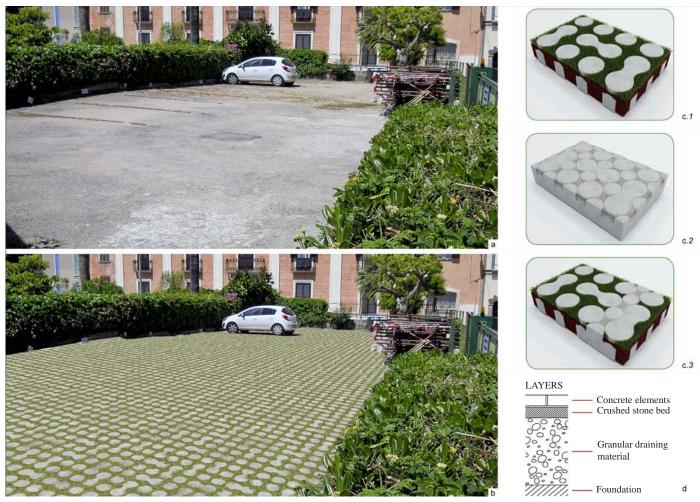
Permeable paving made of concrete pavers, soil and gravel. a) Area reserved for parking in Via Pio IX, present state; b) Area reserved for parking in Via Pio IX, project; c) Type of filling for spaces between concrete pavers: c.1 soil; c.2 gravel; c.3 gravel and soil; d) Layers.
